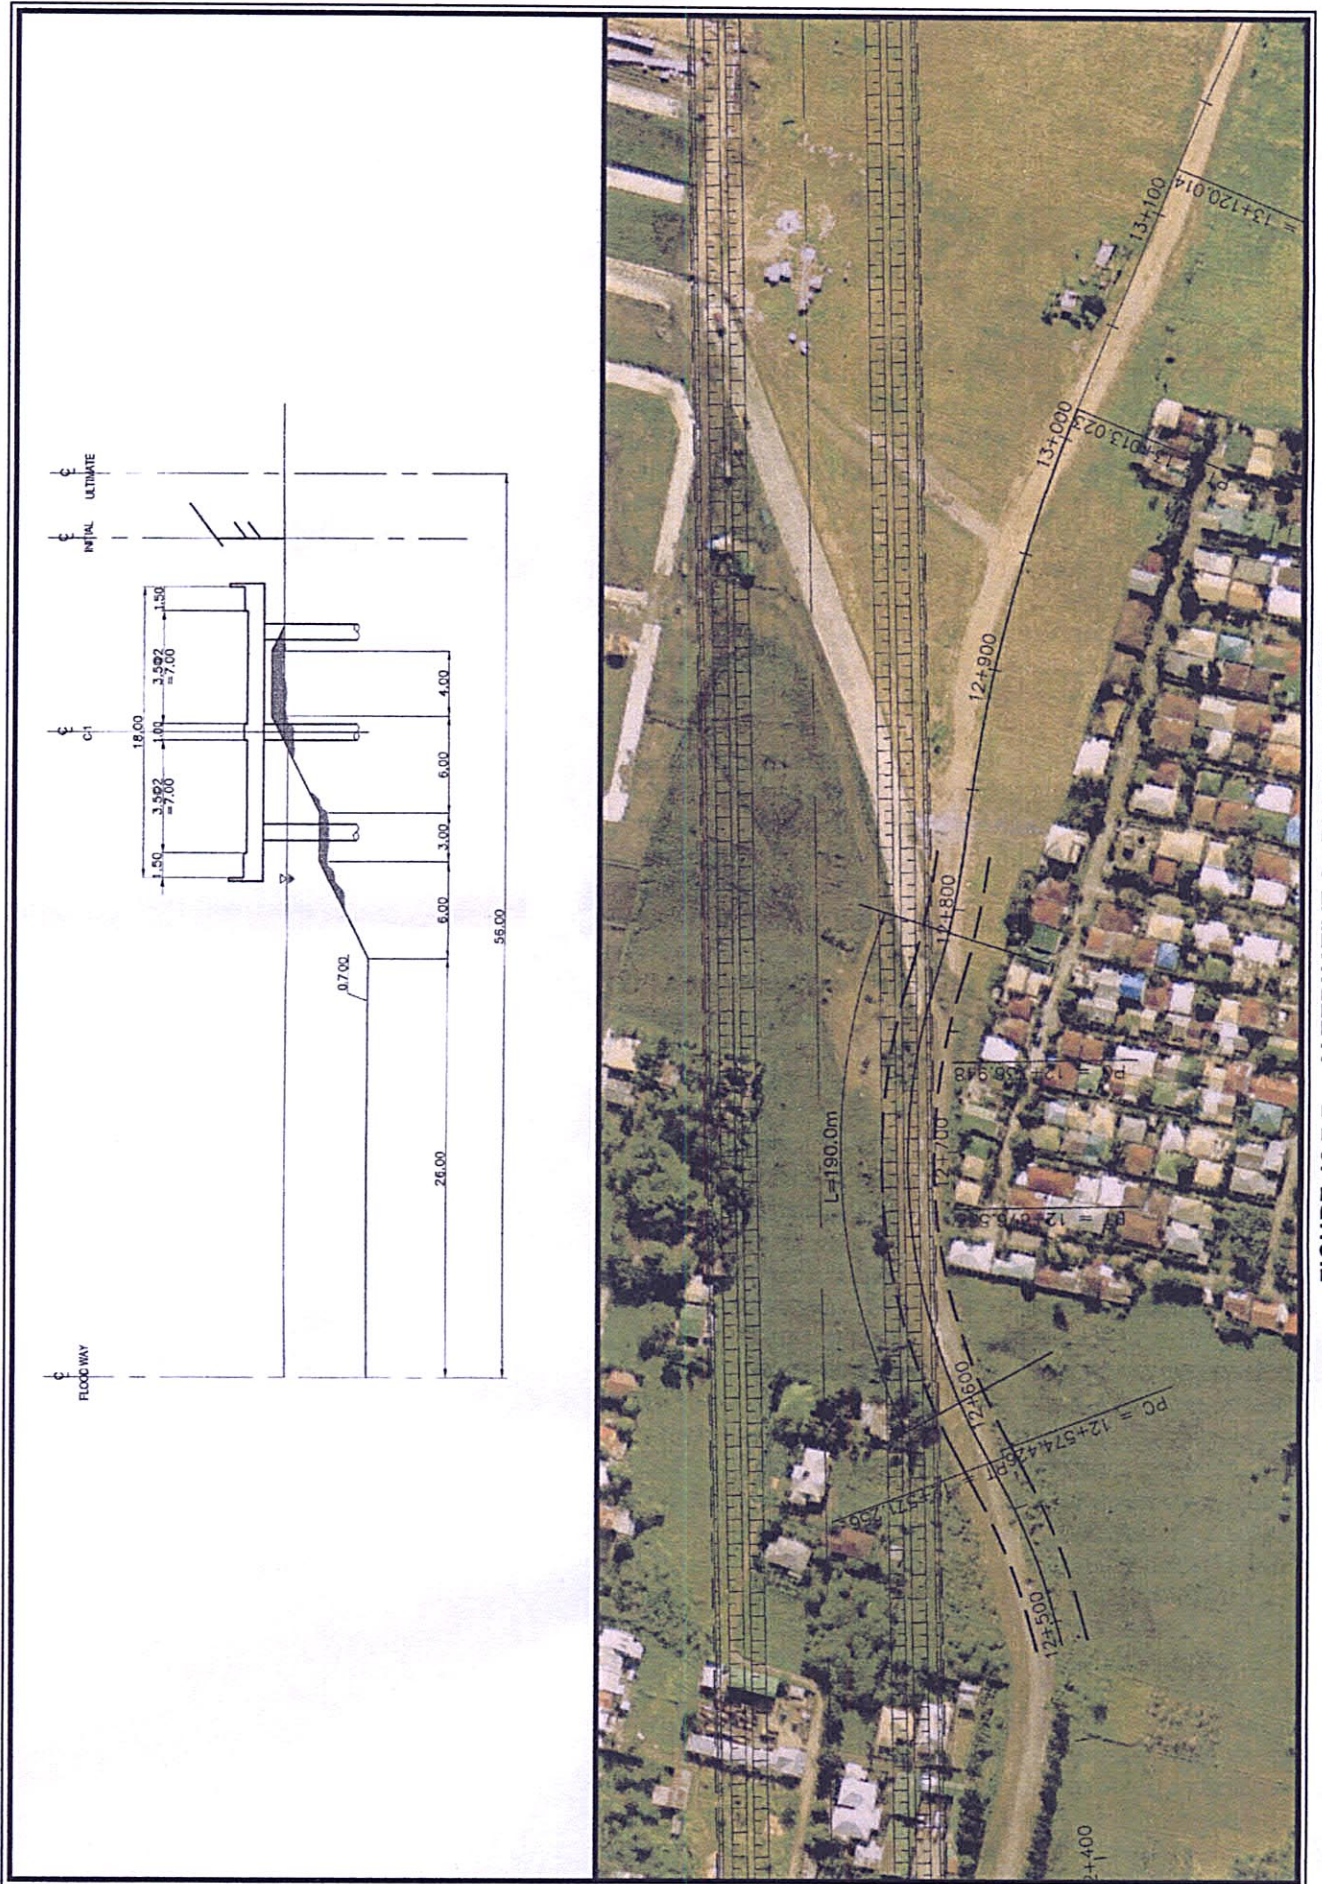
ALTERNATIVE-2 : BRIDGE SCHEME
